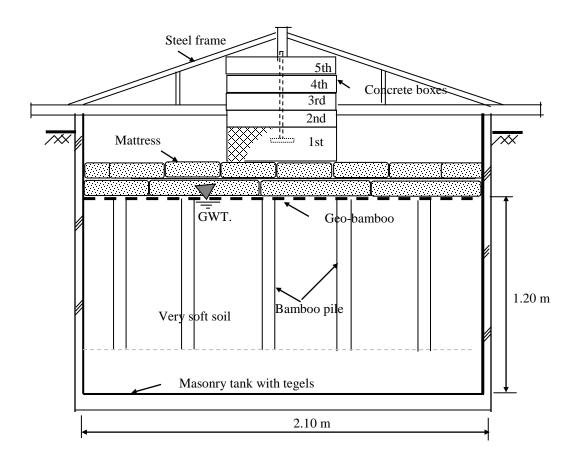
Long-section of the full-scale test by placing concrete boxes at point-2
